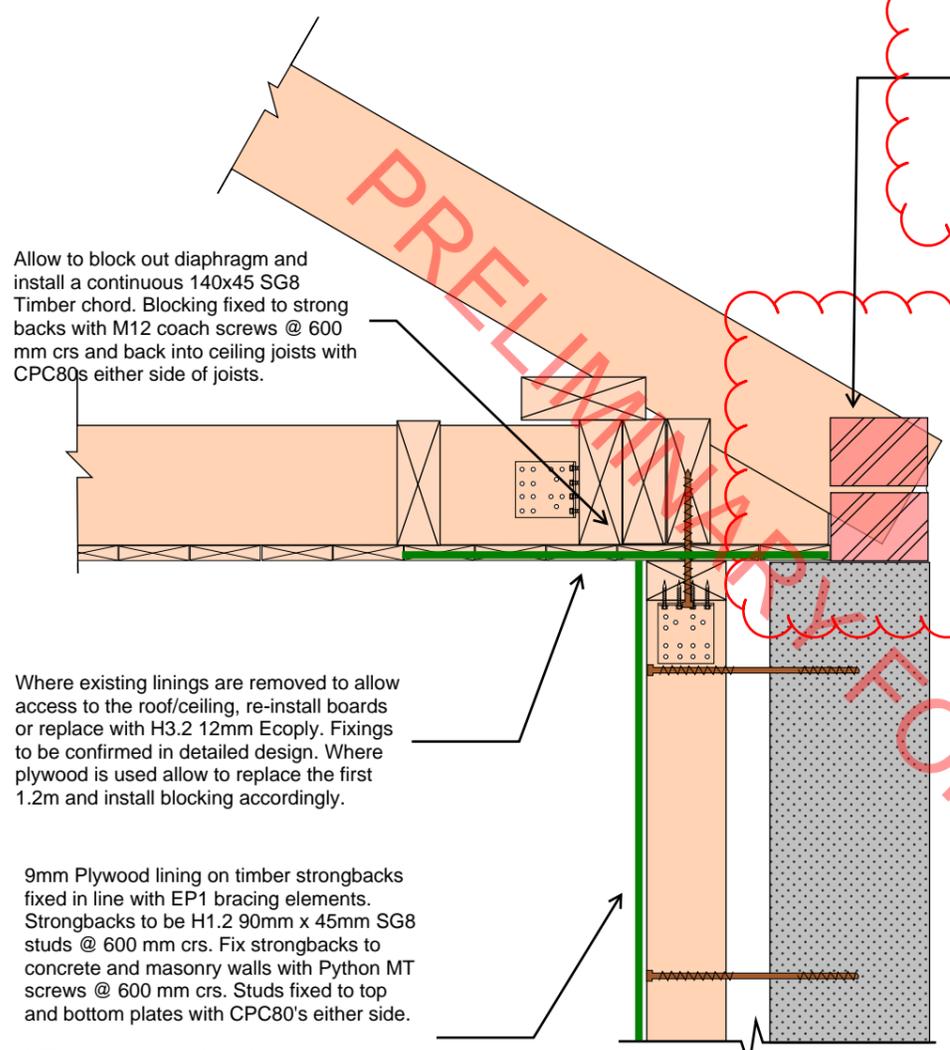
STRONGBACK TO 180MM CONCRETE WALL
